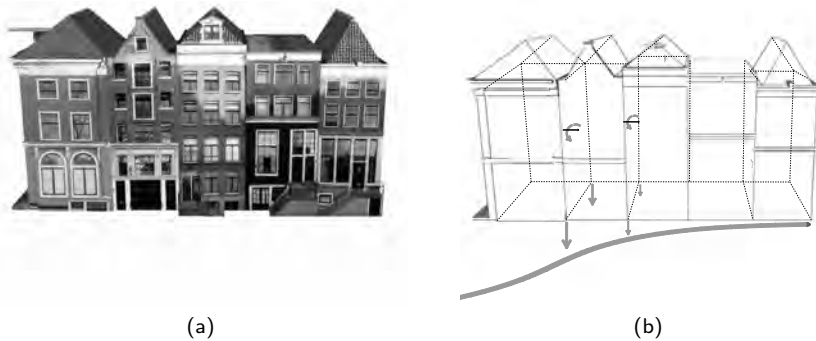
(a) Canal-houses in Amsterdam; (b) tunnelling-induced settlement profile and additional differential settlements transmitted by the two common transverse walls to the façade.
